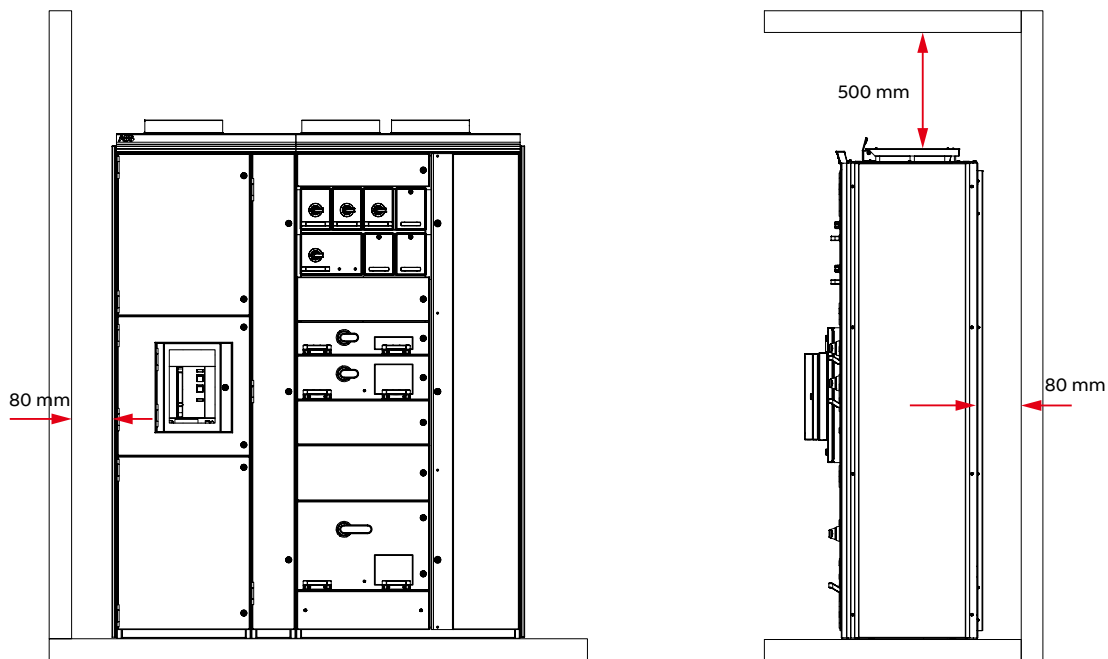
Section minimum clearances for pressure relief roof (flap roof) with right mounted doors
